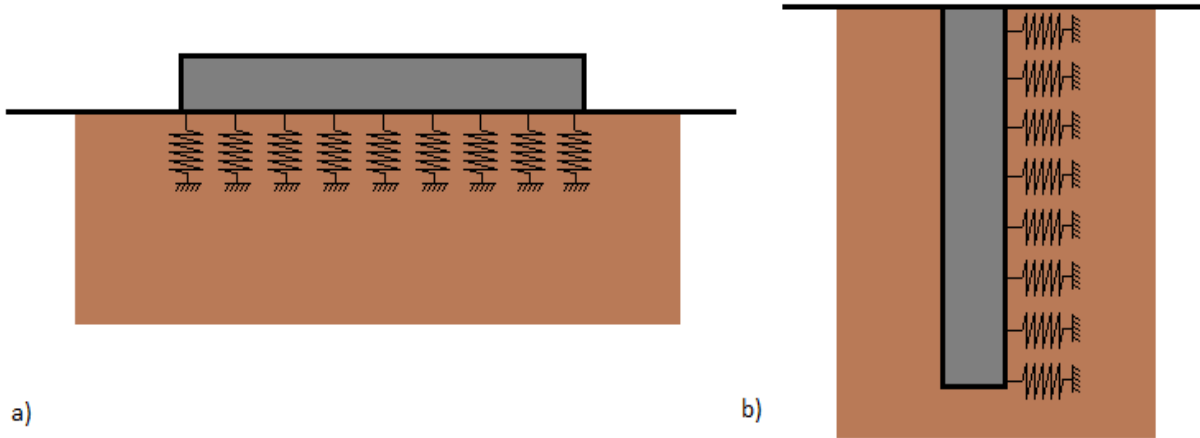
a) beam on an elastic support; b) pile foundation with subjected to lateral load
